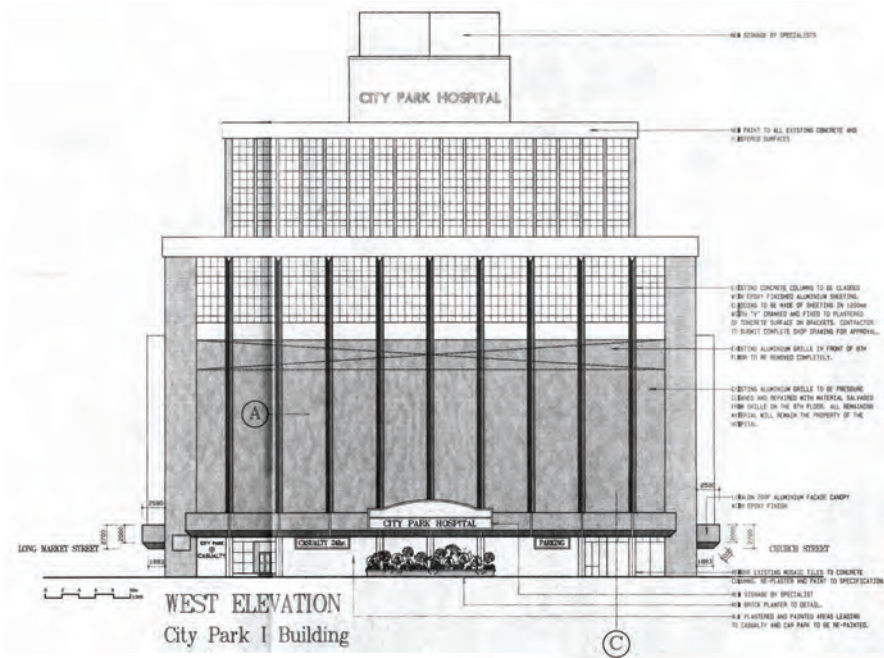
West elevation on Bree Street drawn in 1998 by the architectural firm Brink Stokes Marais & Moolman
